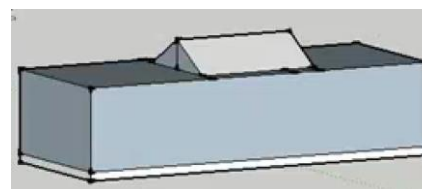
Cathedral ceiling configurations with no step wall, typical with pitched roofs.
